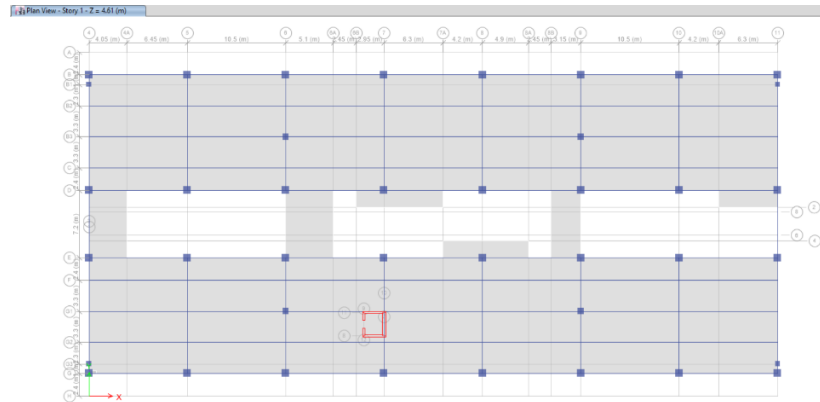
Elevation section view of building first floor in ETABS 2016.
